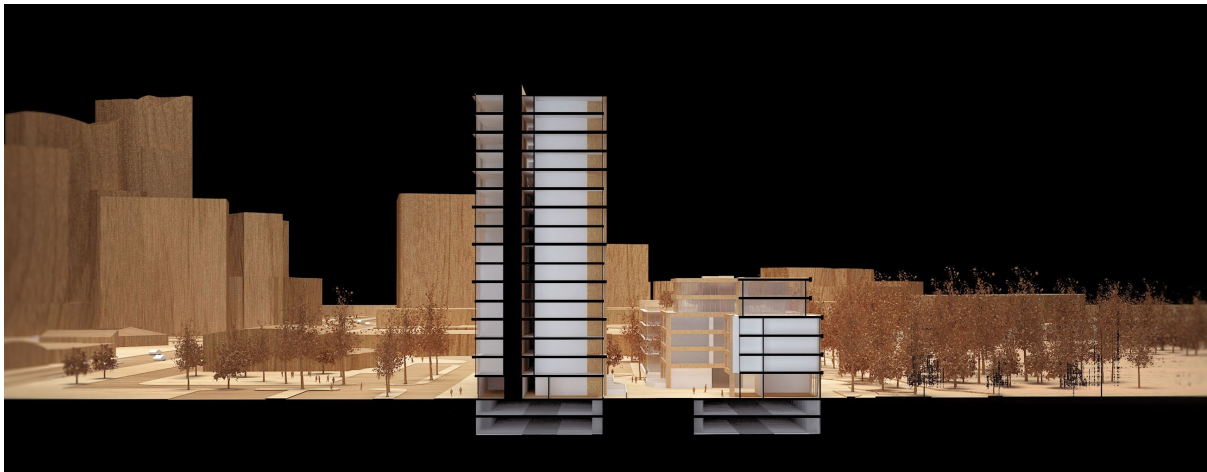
demonstrates the building height transition of low to high across the site from east to west and Figure 22 demonstrates how building heights and separation achieve solar access into lower levels and the centre of the site.
